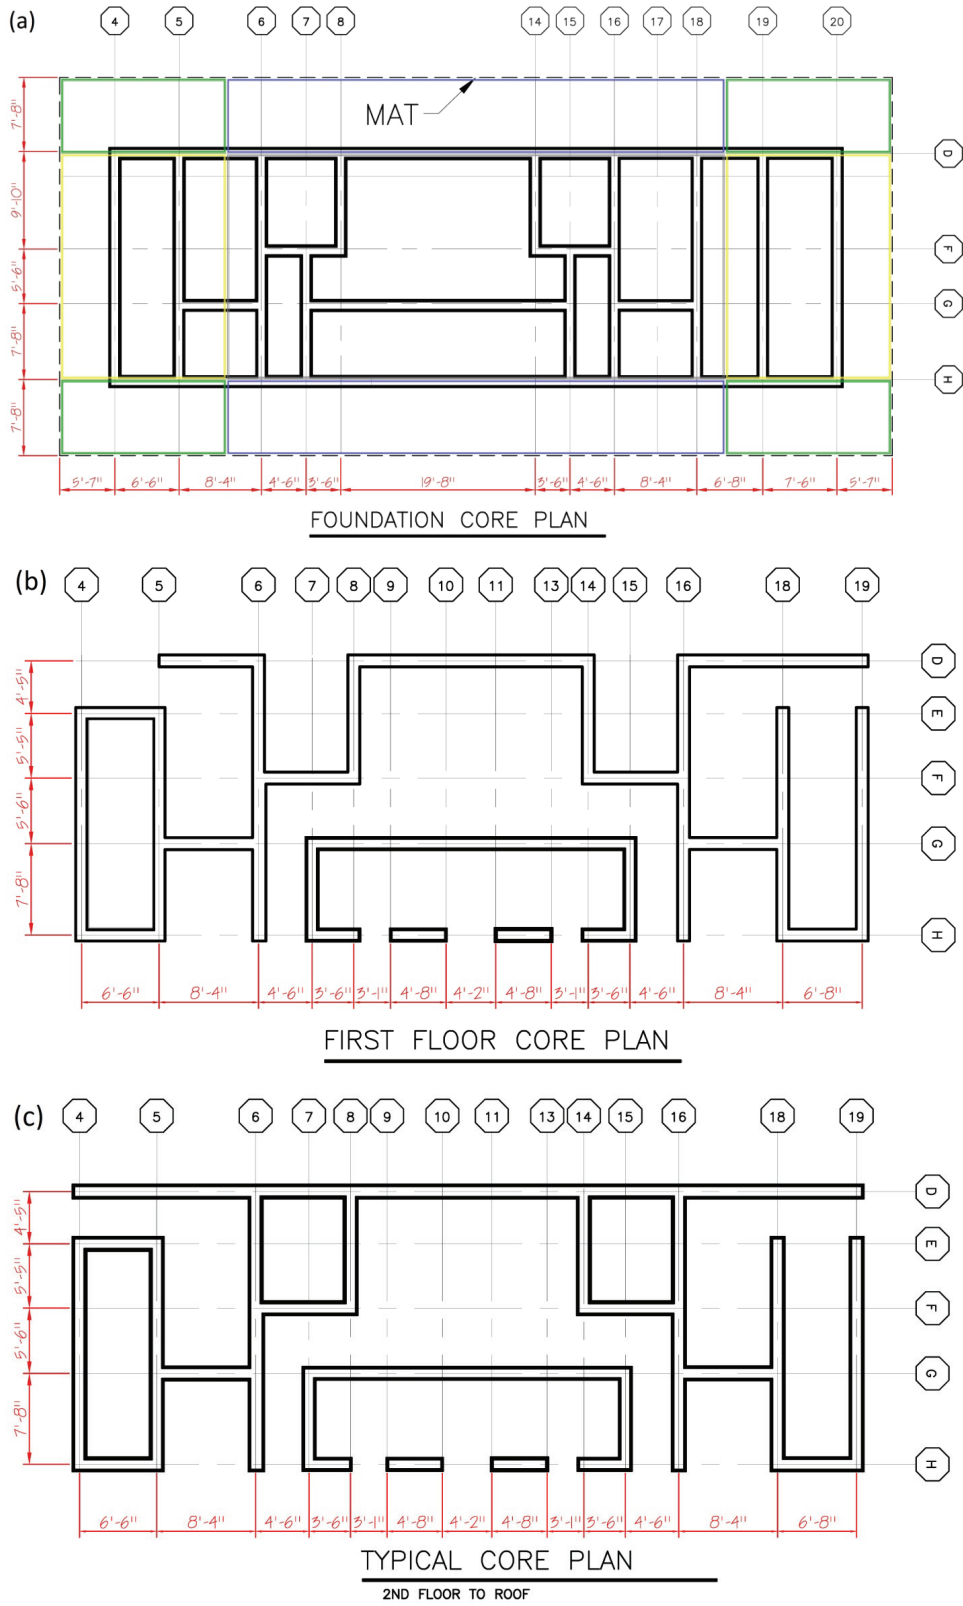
Plan views of the Walnut Creek building shear wall core: (a) foundation level; (b) first floor; and (c) typical floor level.
